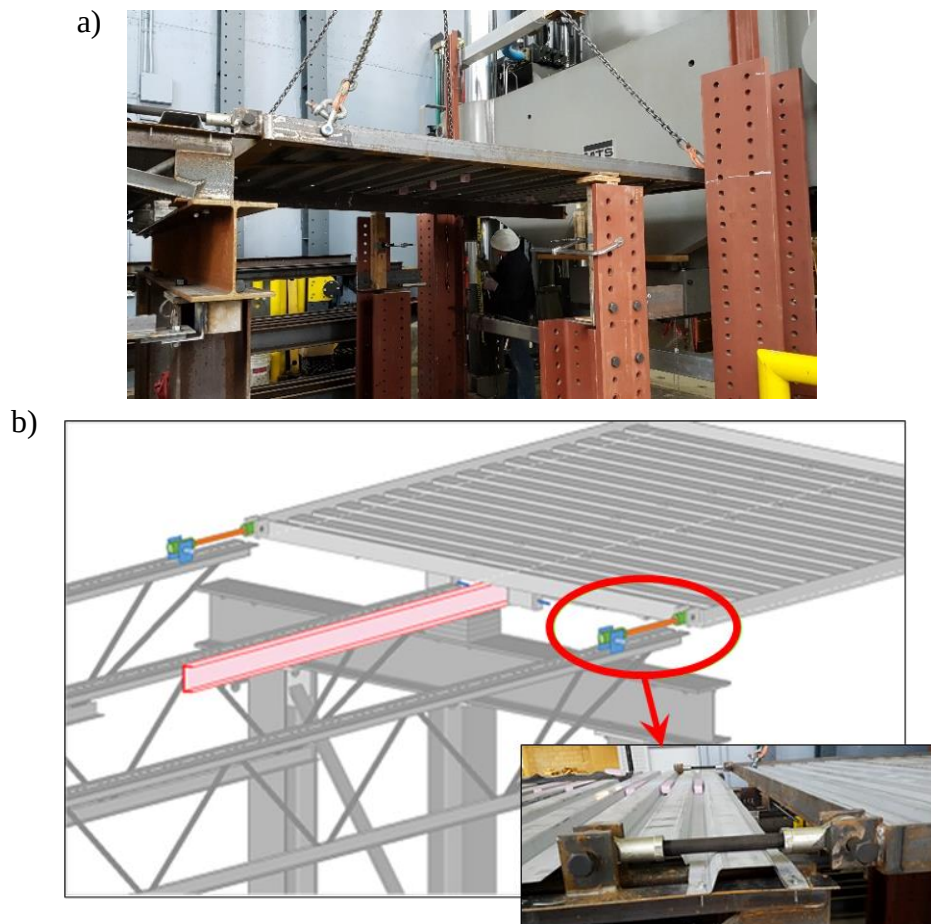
a) Installation of the horizontal frame with steel deck panels providing lateral bracing;
